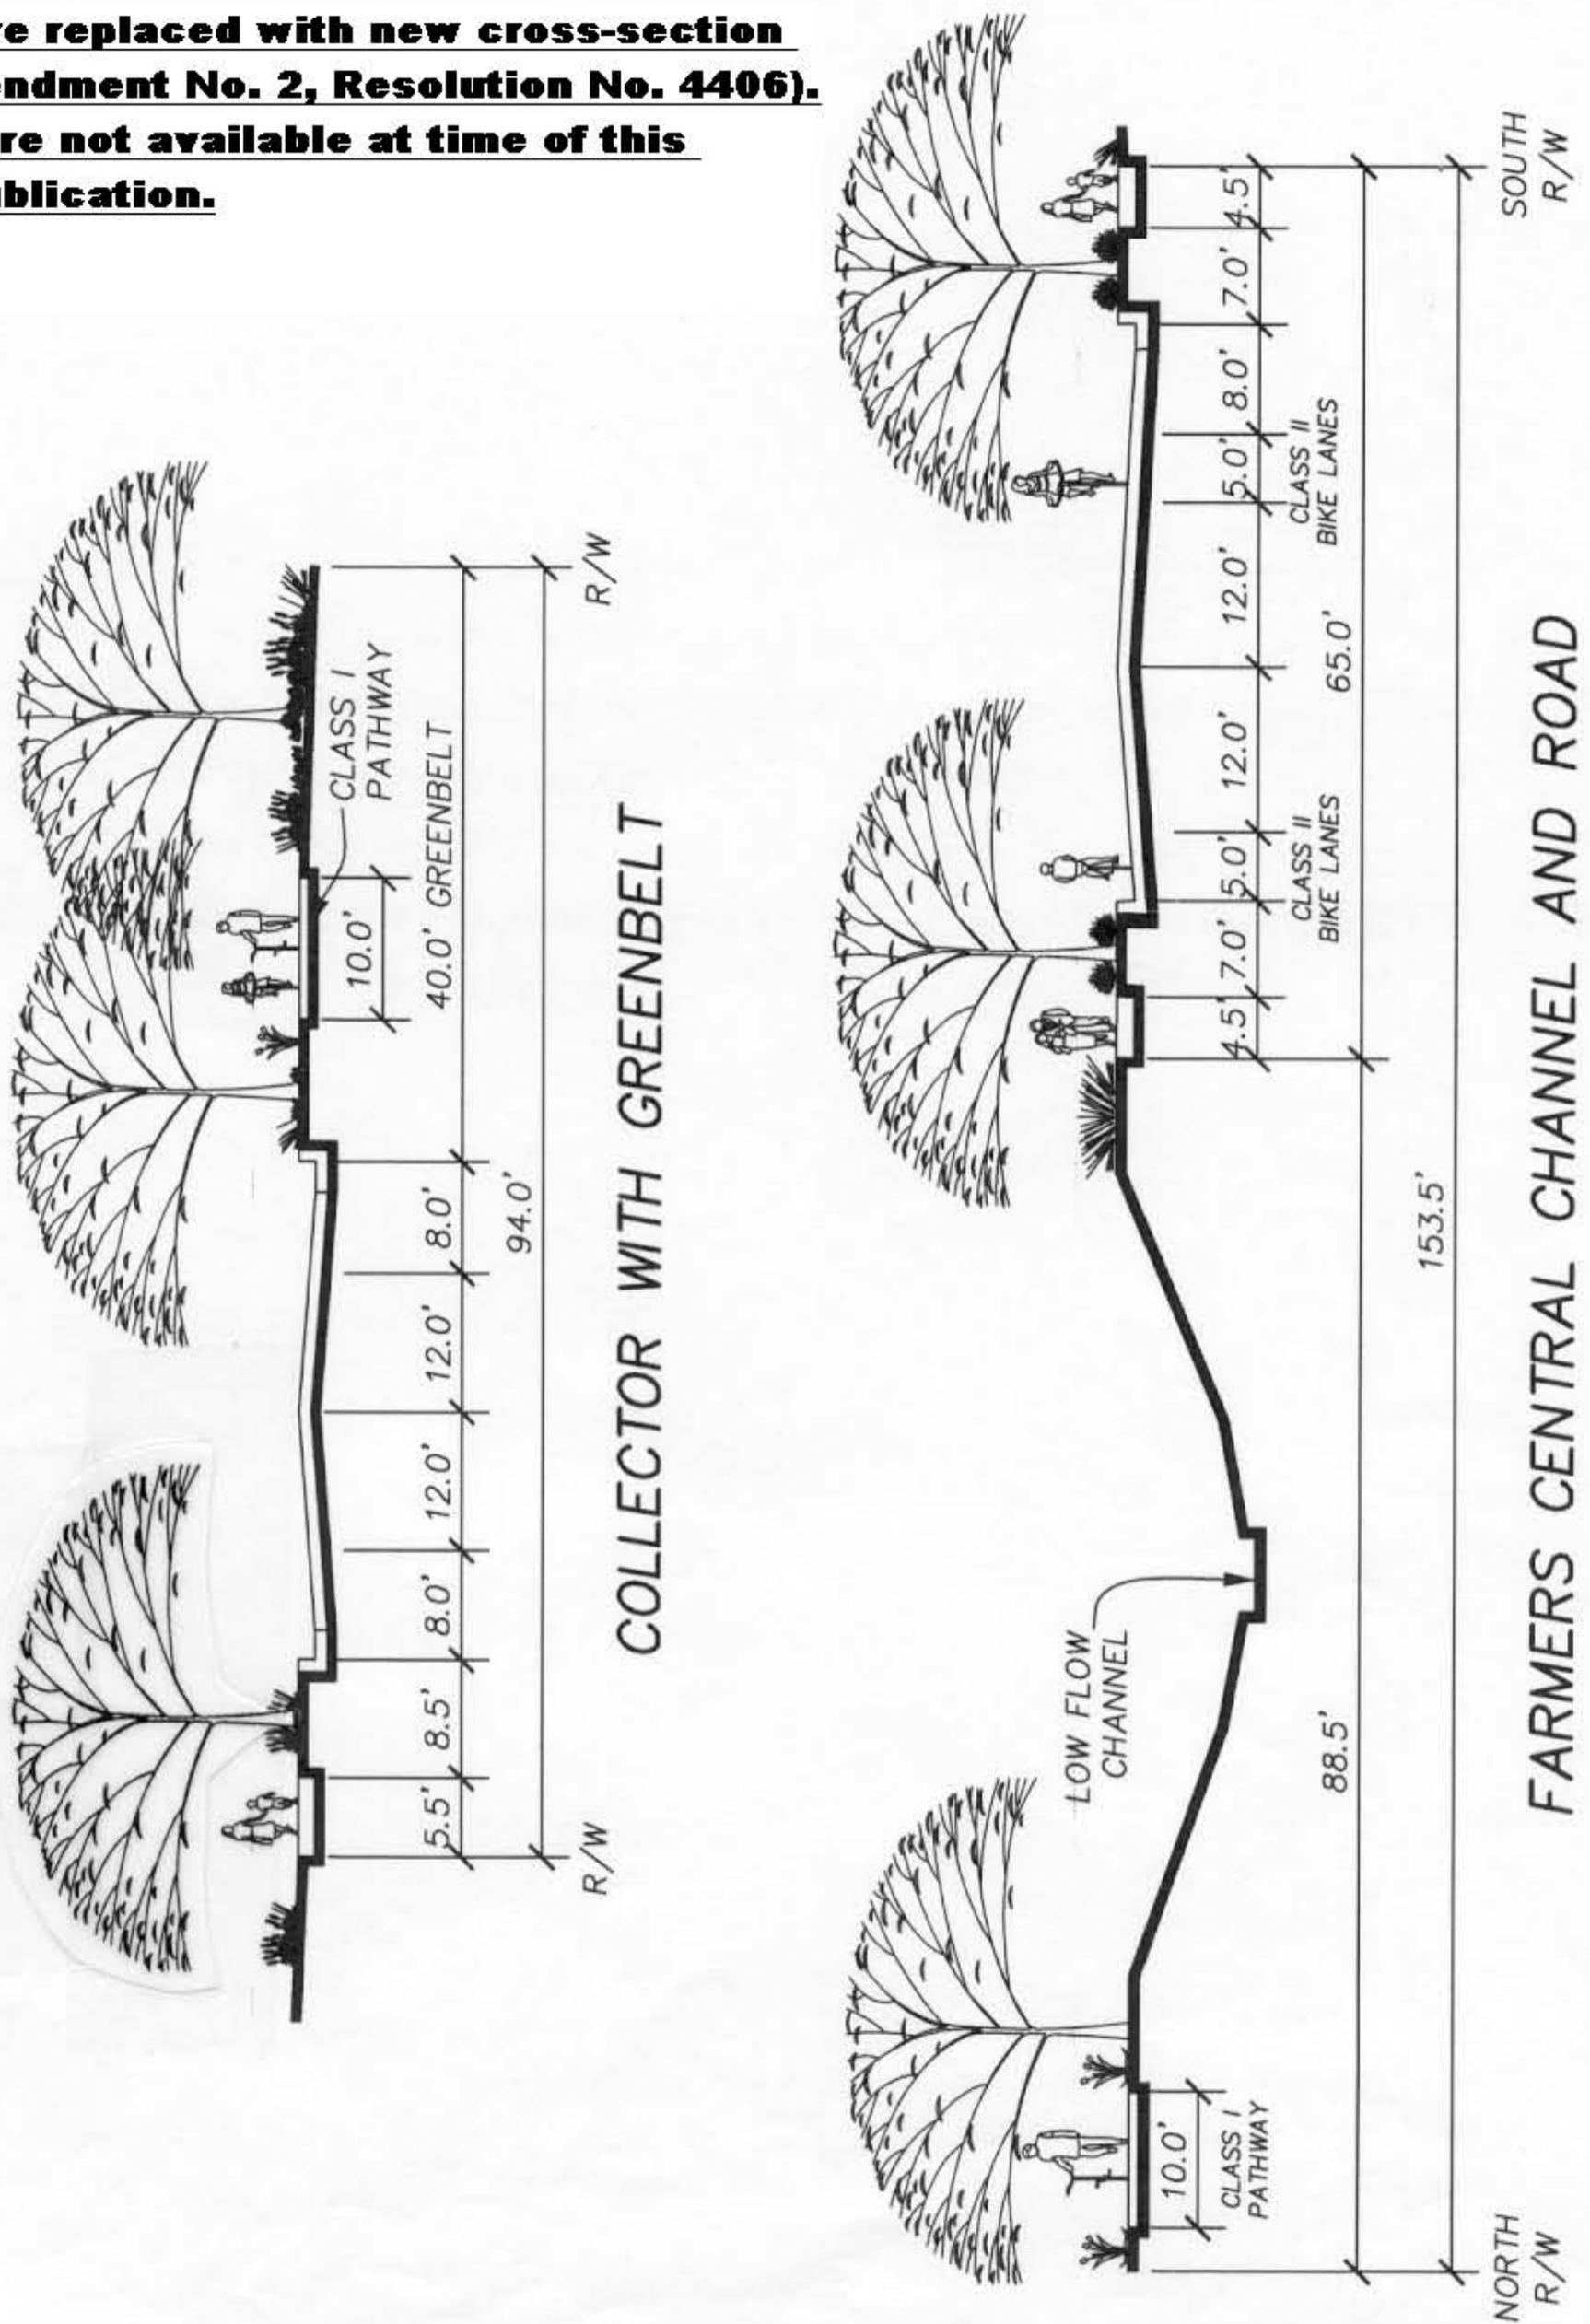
Collector With Greenbelt or Channel Cross-Sections
